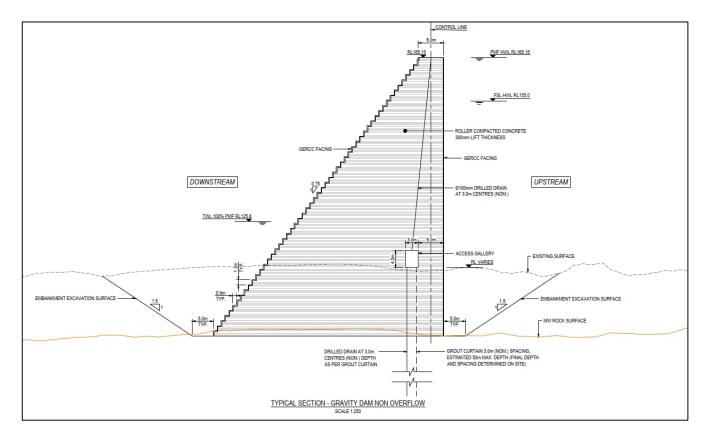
Proposed new Borumba dam wall typical cross section (GHD, 2022)
